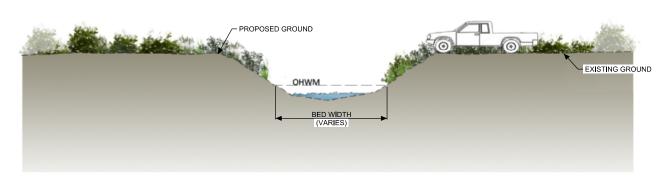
GENERAL ROADWAY WITH OPEN BOTTOM CULVERT STREAM CROSSING
